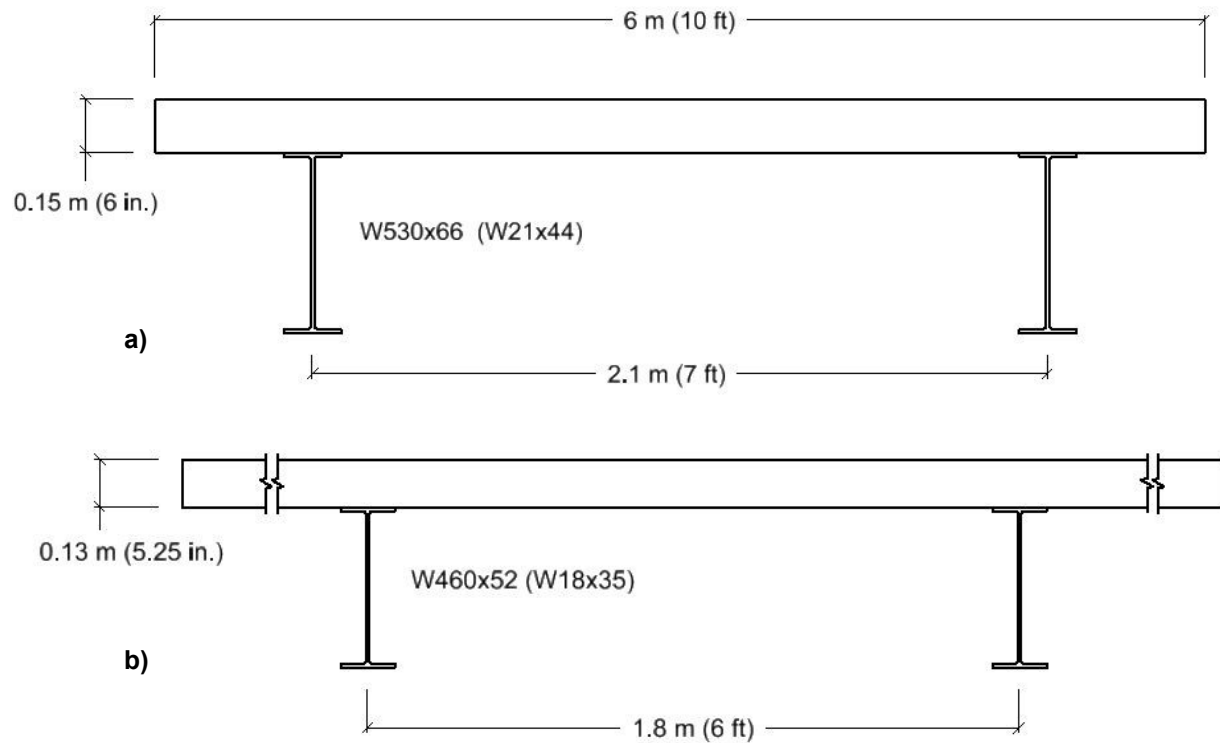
Cross section of the pedestrian footbridge from AISC DG11 2016 (a) and cross section of the composite floor from Perry et al. 2003 (b)
